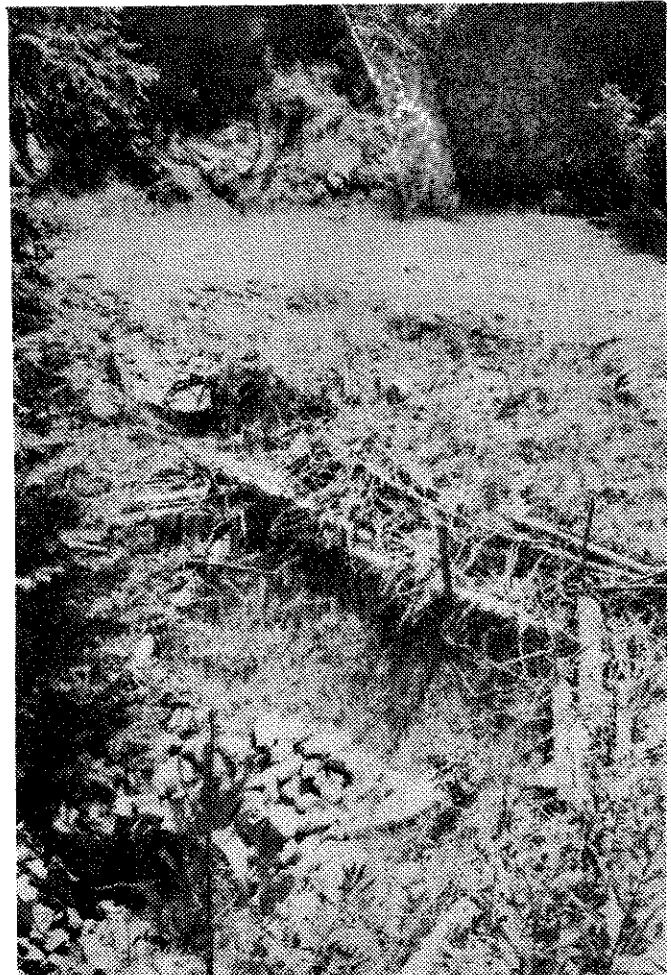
A well constructed road that includes an armored culvert, vegetated fill slopes, and slash filter windrows at the stream crossing.
